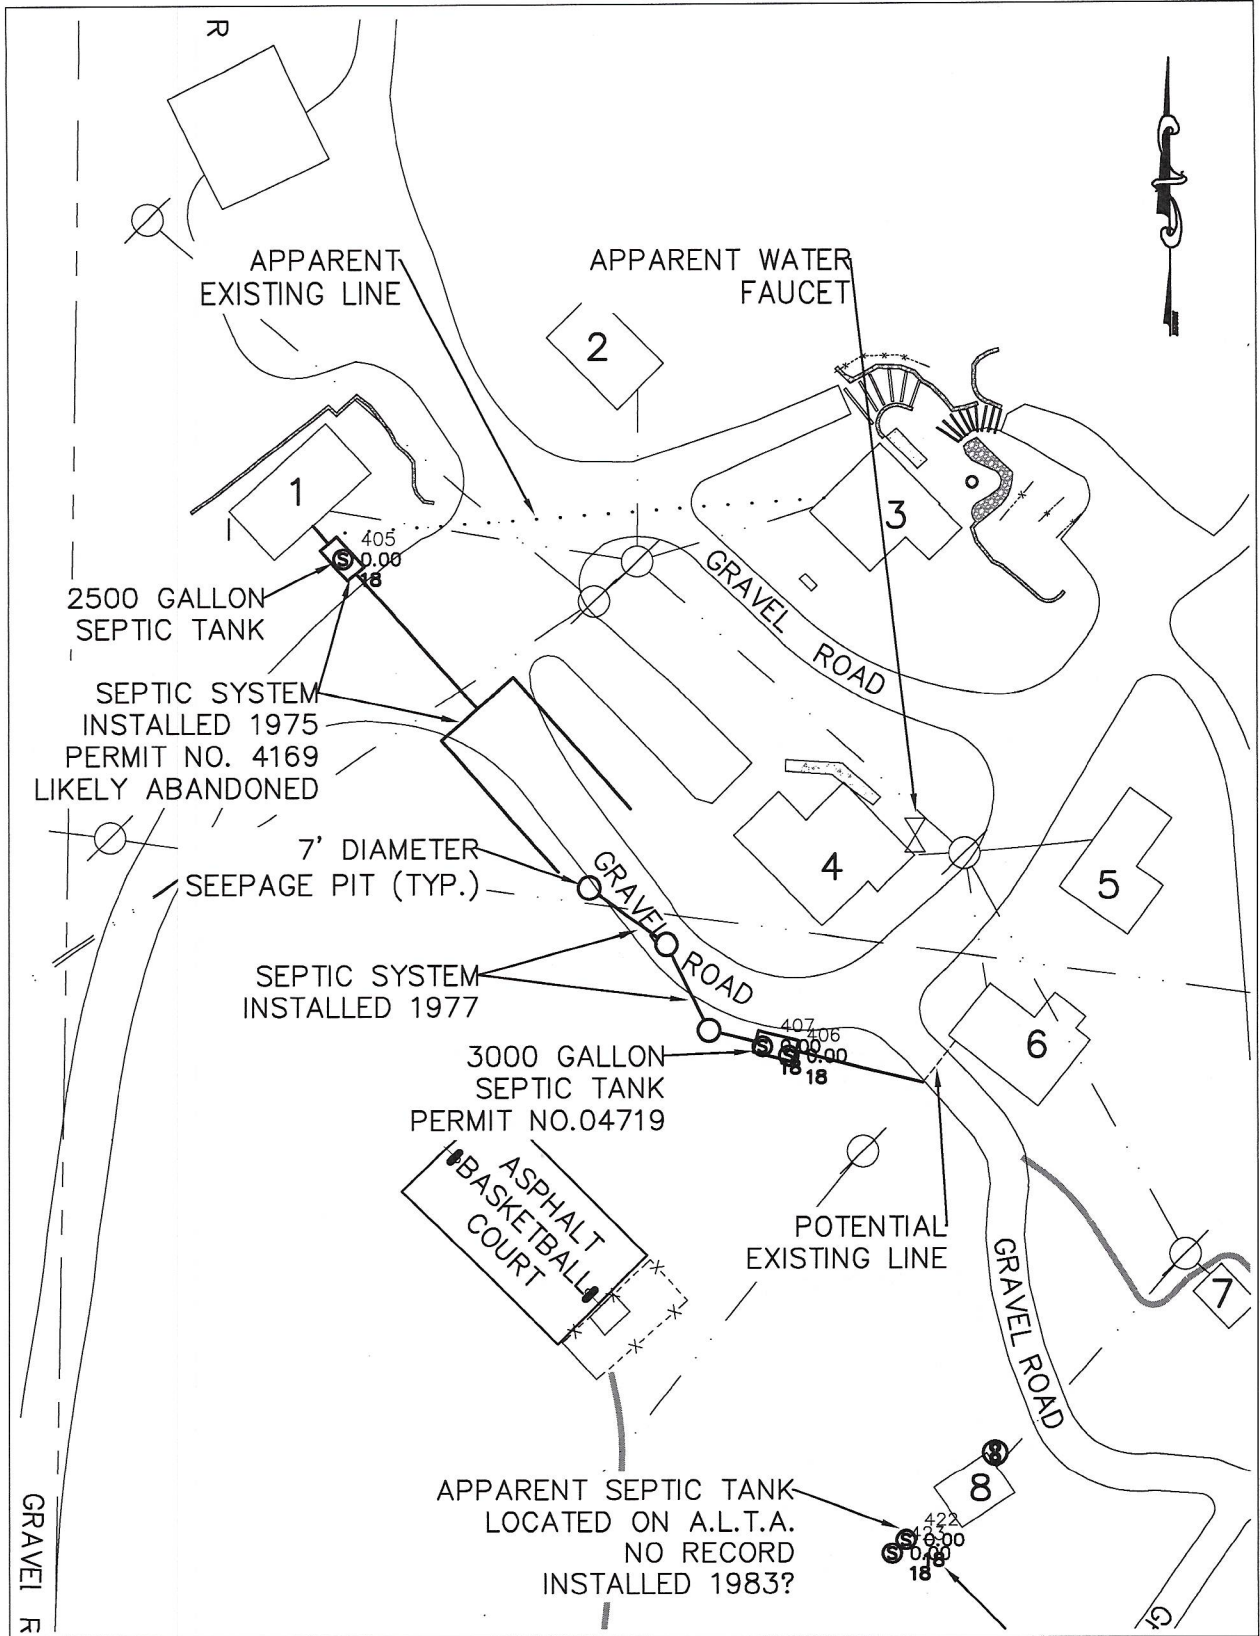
shows the layout of two OWTSs serving Buildings #1 through #8.
